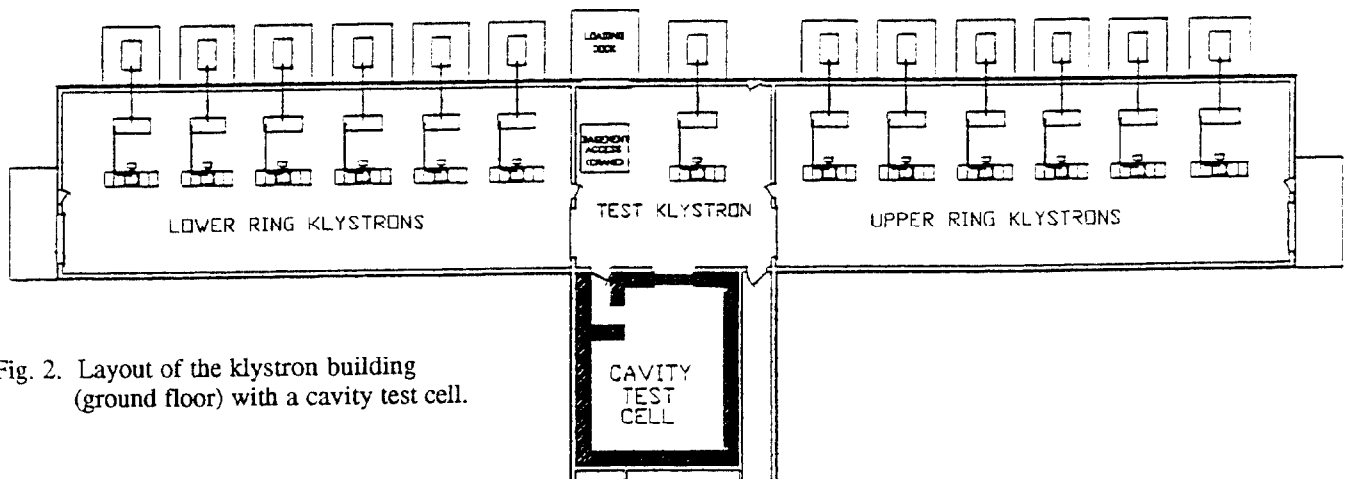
Layout of the klystron building (ground floor) with a cavity test cell.
